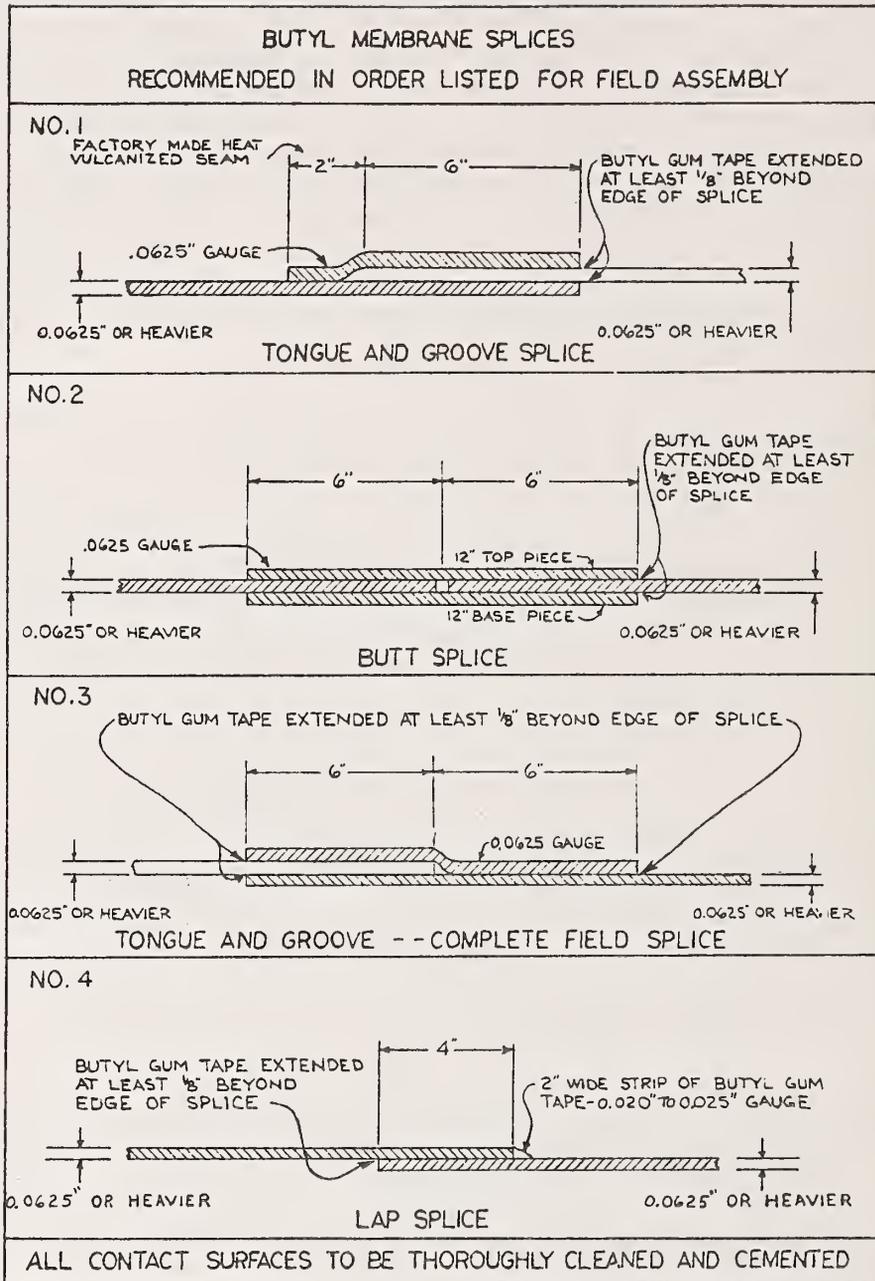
TYPICAL MEMBRANE SPLICING DETAILS
